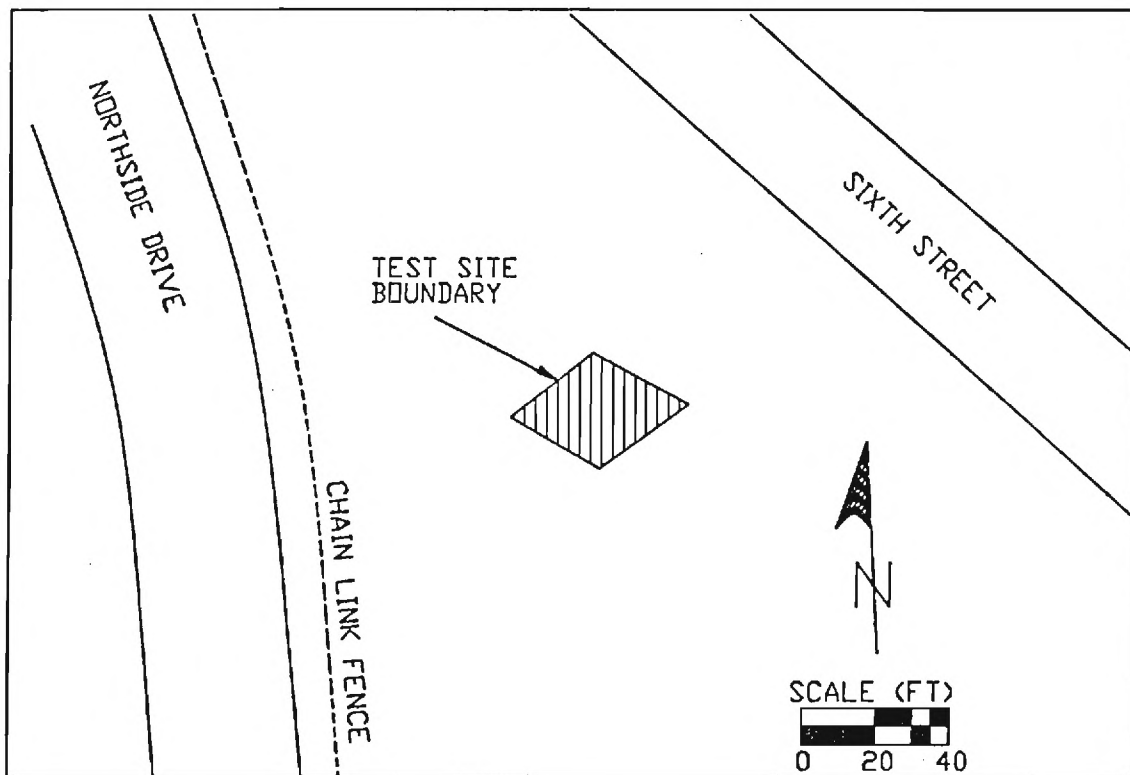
Site Location Plan for Drilled Shaft Load Tests on Georgia Tech Campus.
